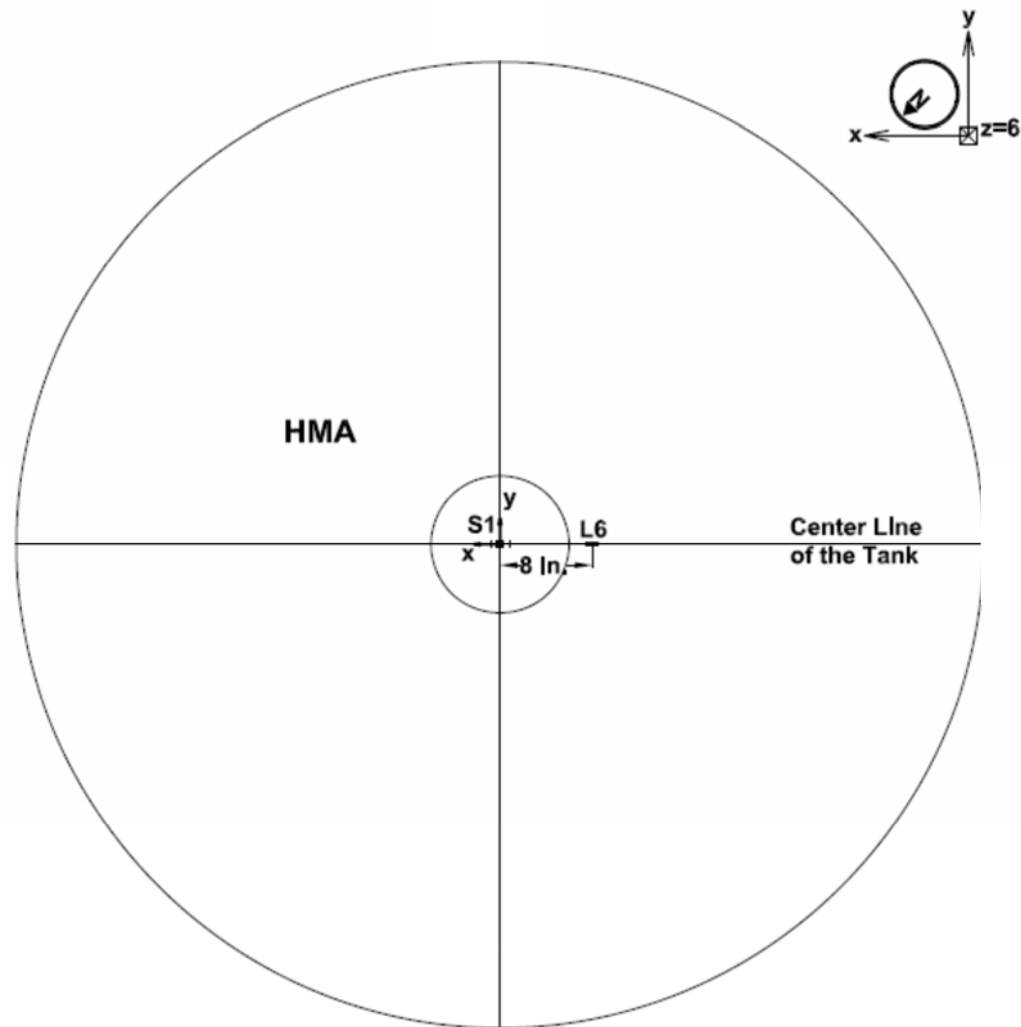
Instrumentation plan for experiment No. 3— Plan view, Z = 6 inches
